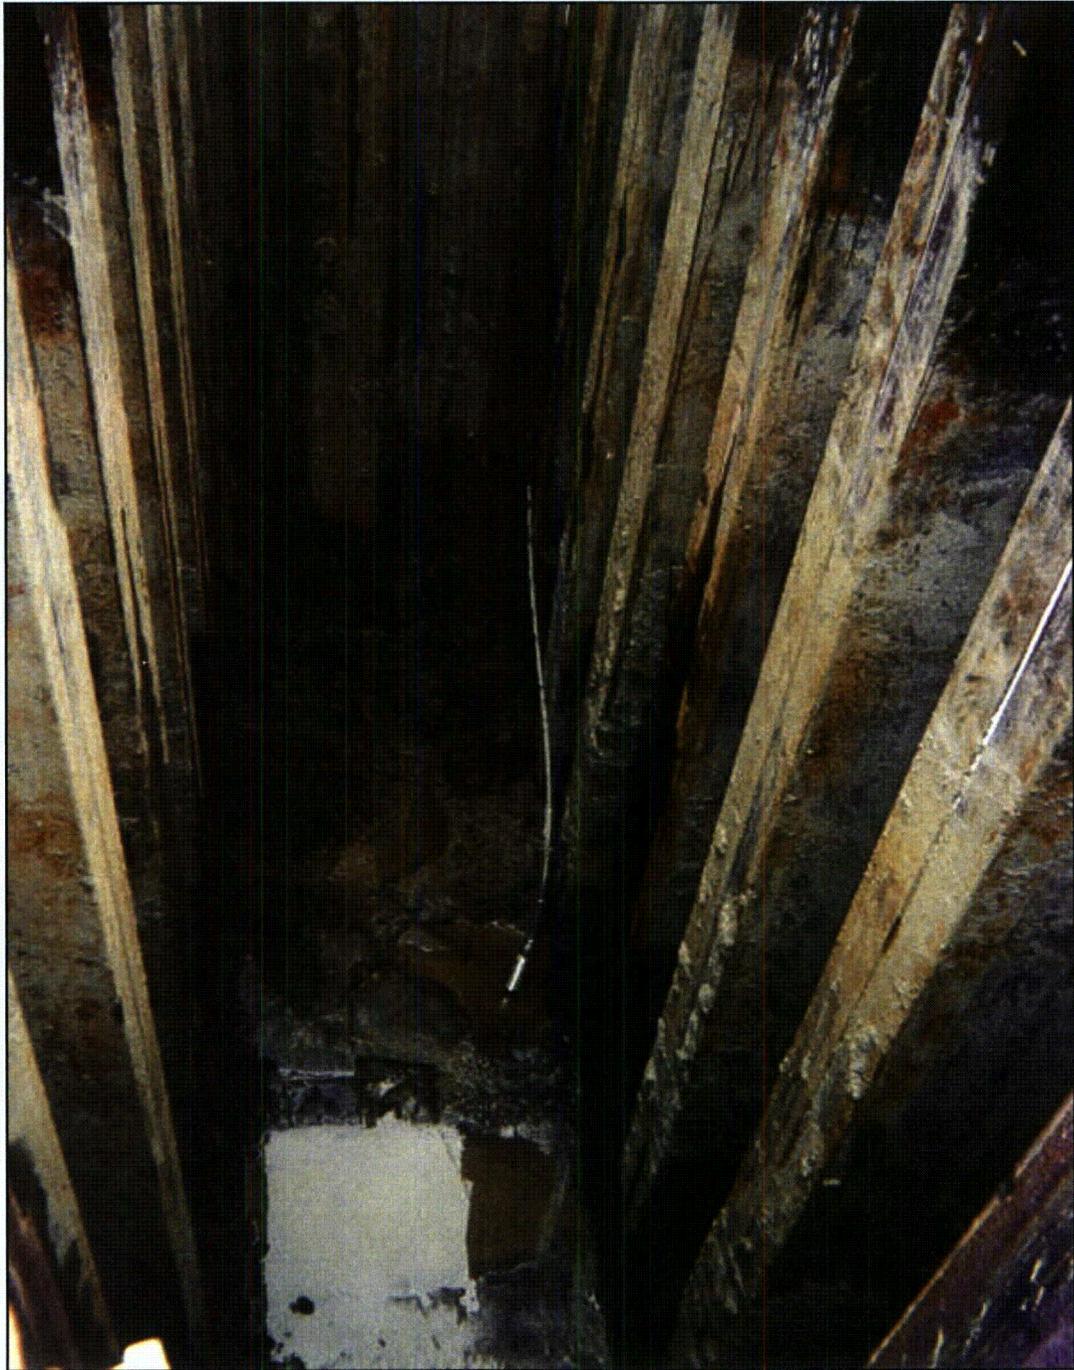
Excavated Permeable Treatment Wall Before Backfilling with Clinoptilolite Showing Sheet Piling Supporting the Excavation
